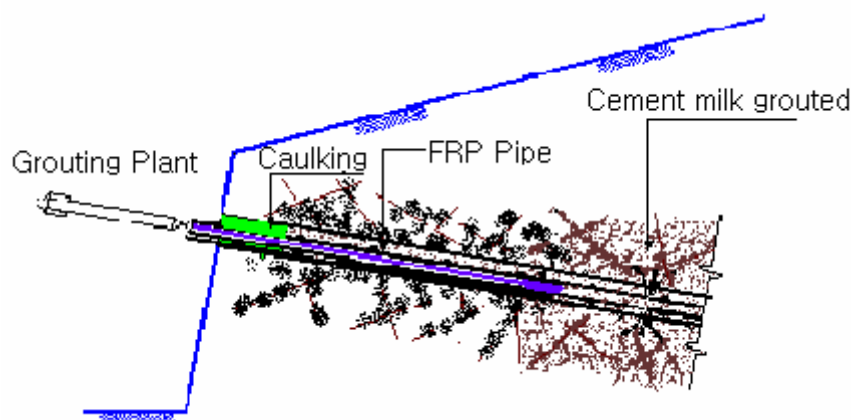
Basic concept of FRP pipe reinforcing method, Kim(1)
